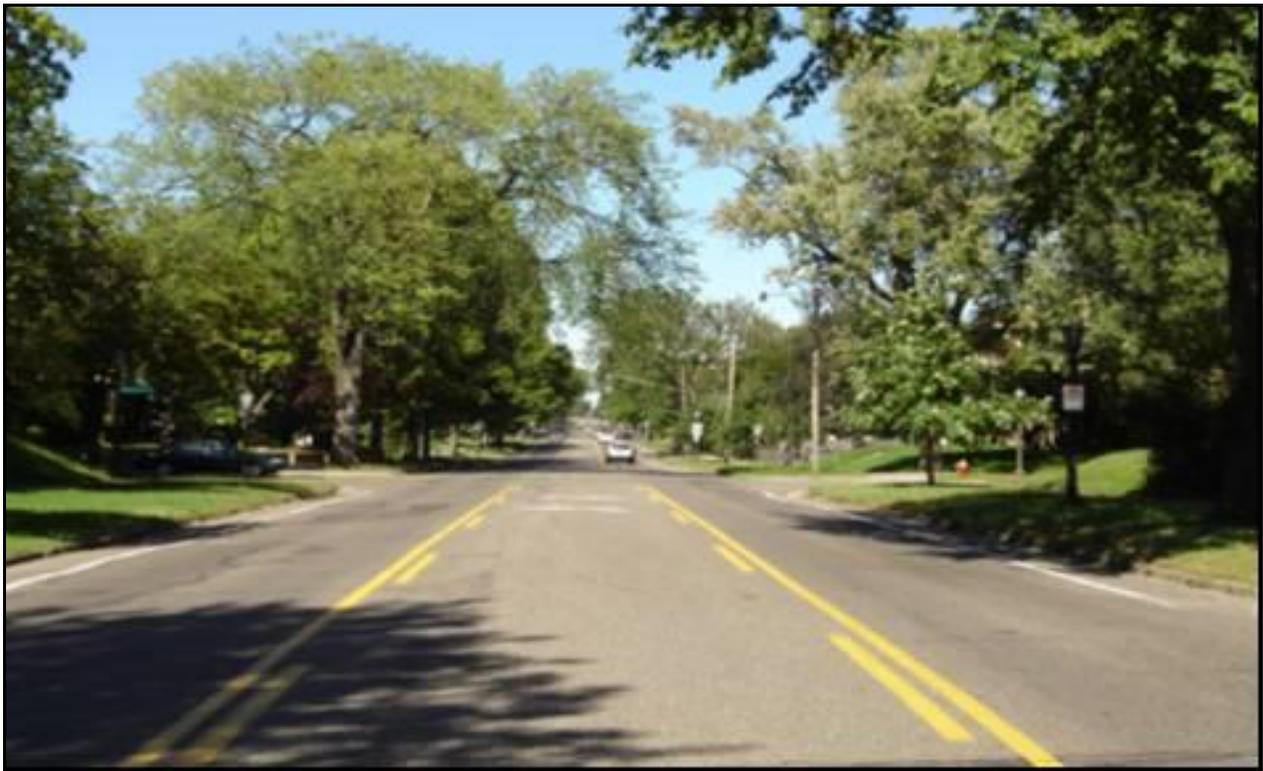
Lexington Parkway After Conversion towards Lincoln Avenue
